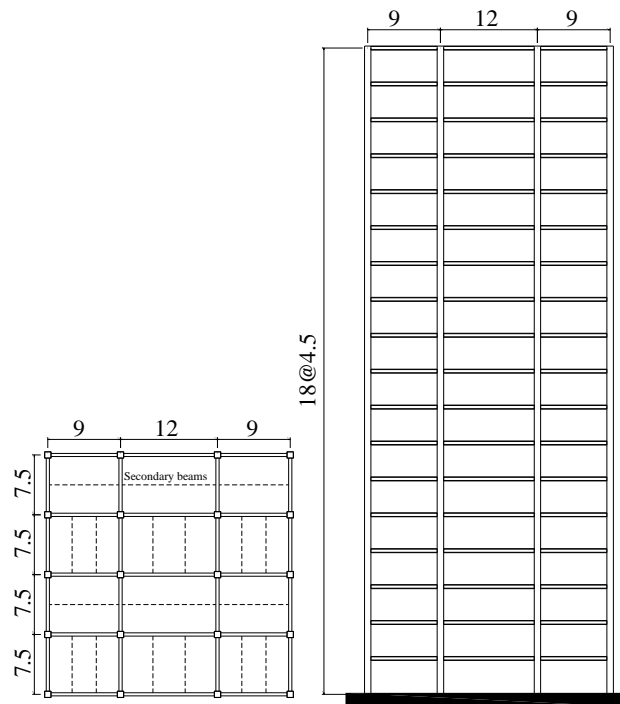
Plan and elevation view of the 18-story building (dimensions in meters)
